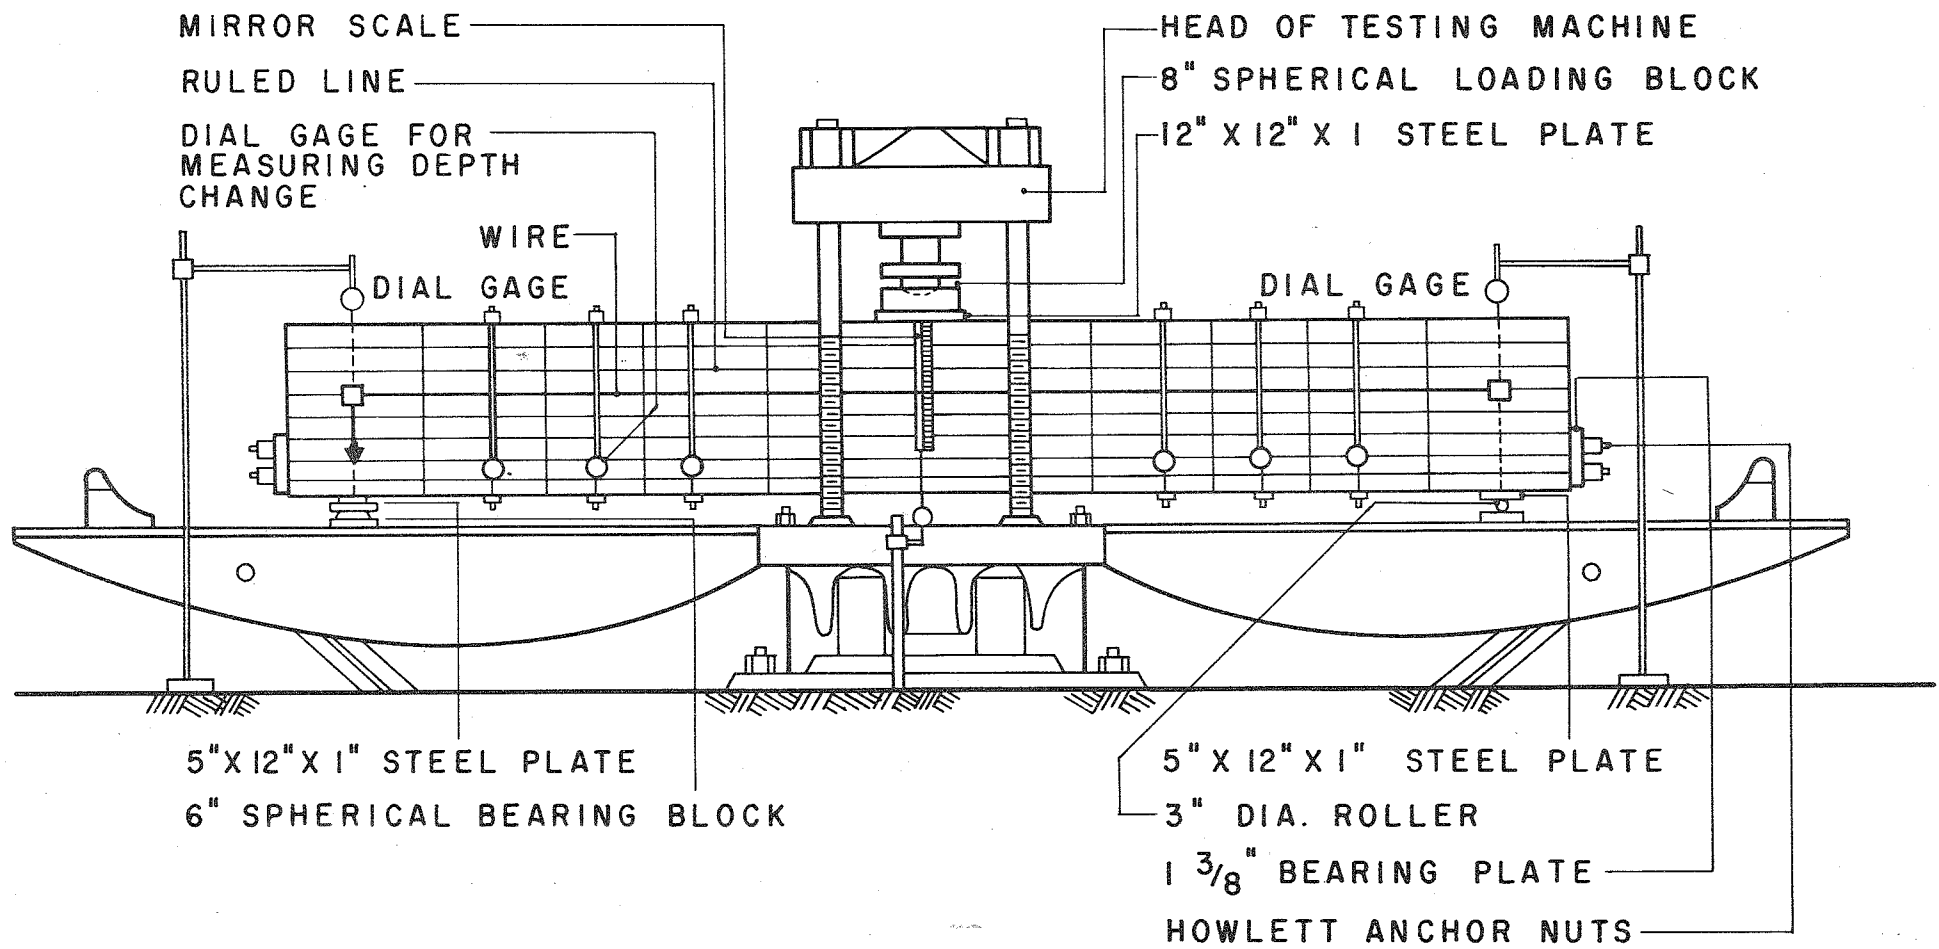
LOADING ARRANGEMENT AND INSTRUMENTATION
